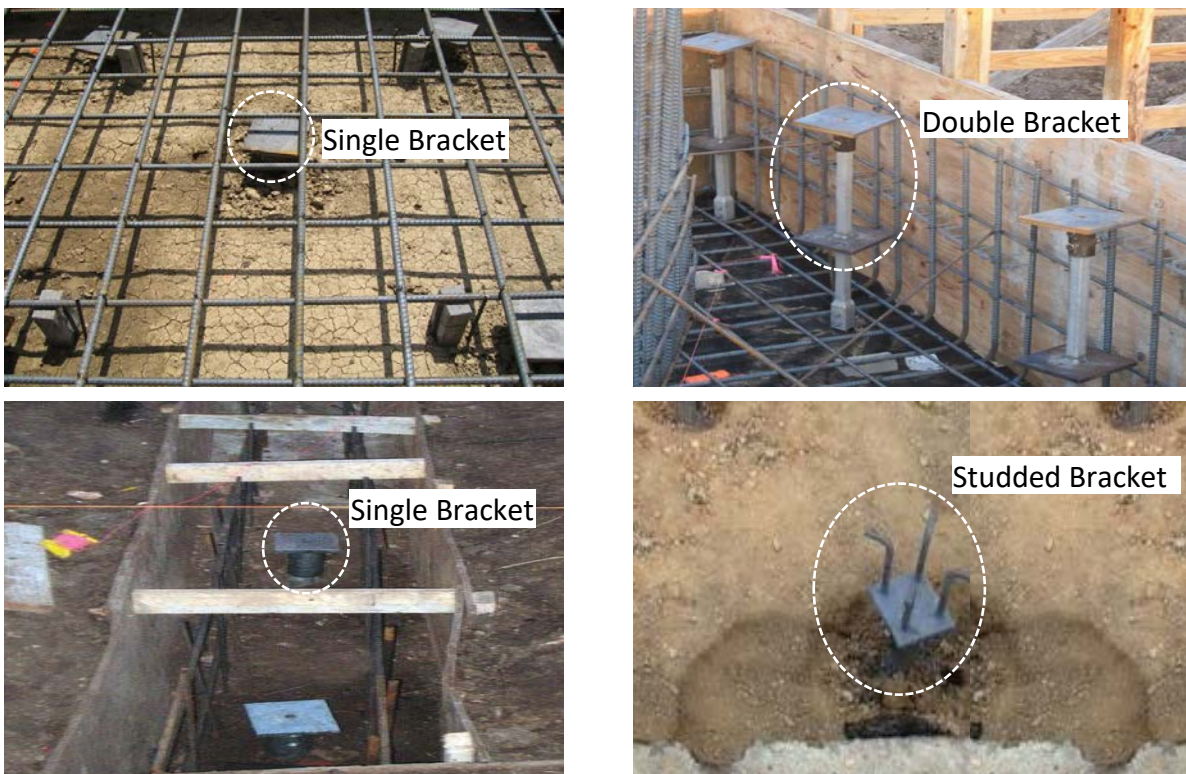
Anchorage of helical piles (Supportworks 2018).
